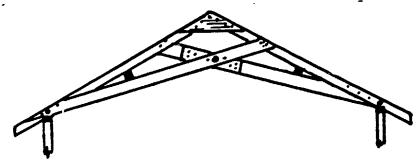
shows some common types of roof trusses constructed from C.P.W.
